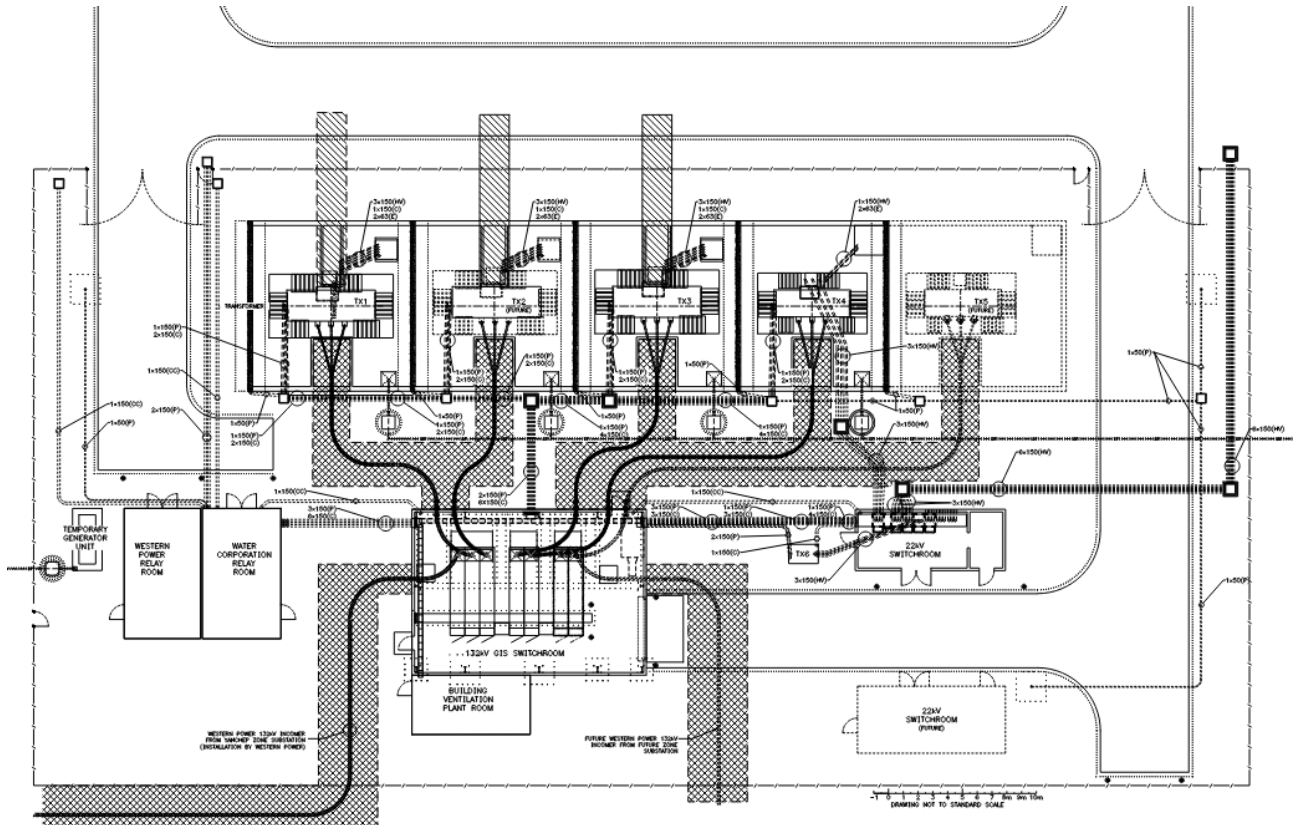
Typical Plan Layout of a 132kV Power Substation (Northern Water Partnership, 2023)
